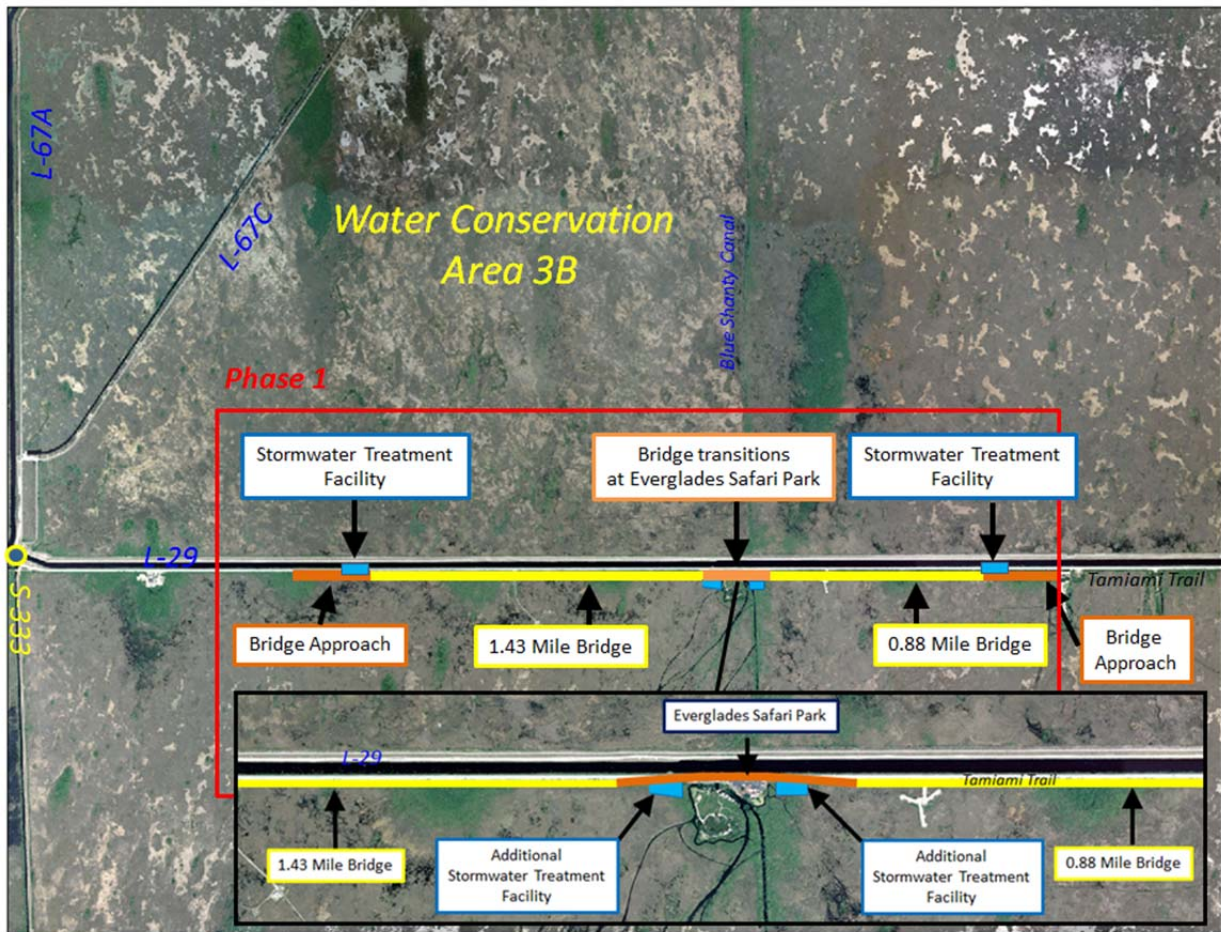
2014 Modified Plan depicting the location of the two bridges instead of the original authorized 2.6 mile bridge. The inset shows the location of the two additional wetland treatment facilities on the east and west sides of the Everglades Safari Park that were required by Florida Department of Environmental Protection when the plan was modified from a single span to two bridge spans.
